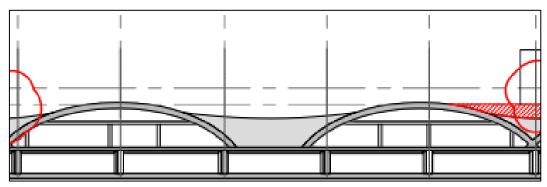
Extract from approved eastern elevation, showing the complexity of the approved roof form Source: Group GSA
